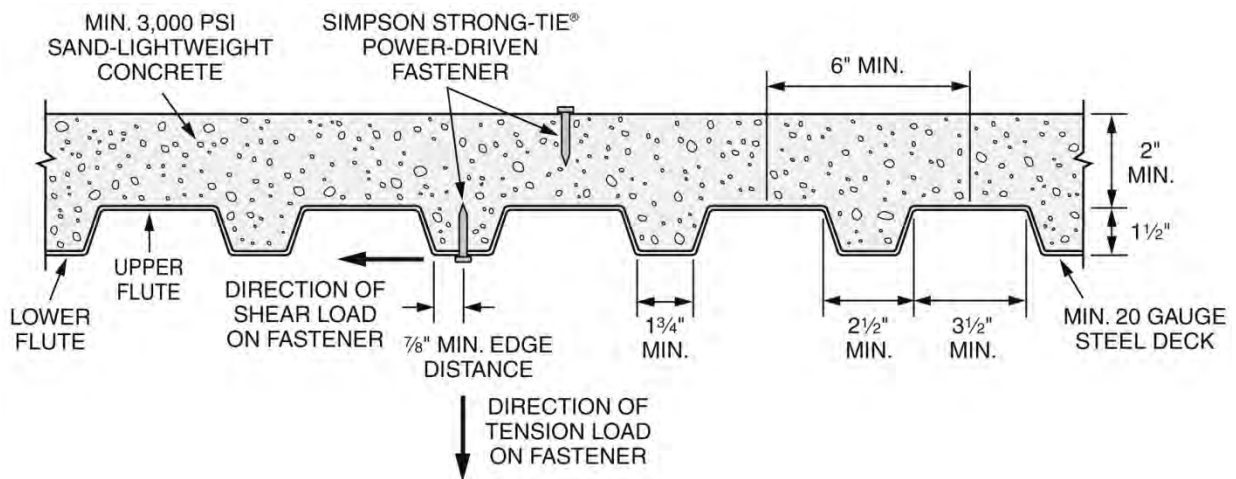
INSTALLATION IN 2-INCH CONCRETE FILL OVER 1 1/2-INCH-DEEP STEEL DECK
